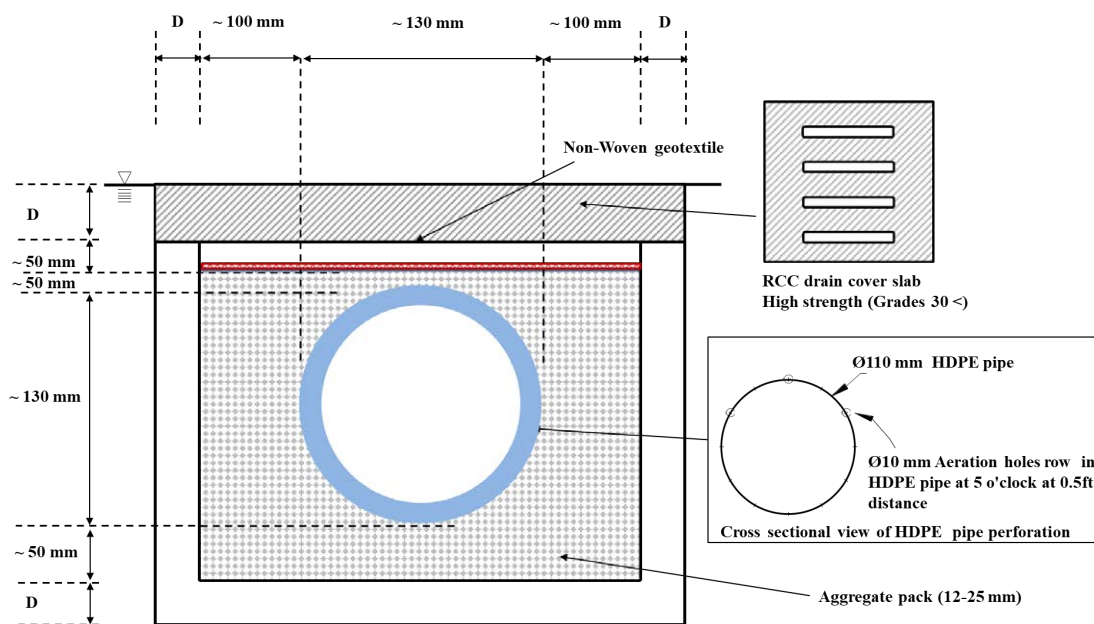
Schematic section of aeration trench and pipe layout forced aerated compost piles.
